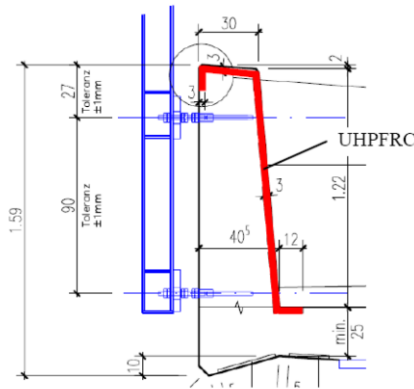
Typical cross section of the crash barrier wall and view after rehabilitation (Bruhwiler and Denarie, 2008)
